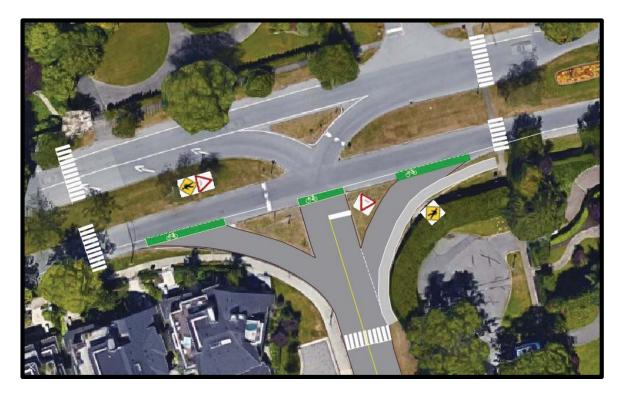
Proposed Upgrades to Existing Intersection: AutoCAD Layover
